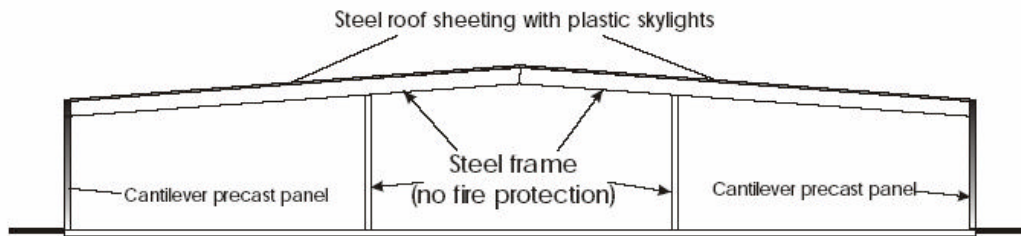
Industrial buildings recently constructed in New Zealand (Lim, 2000)
